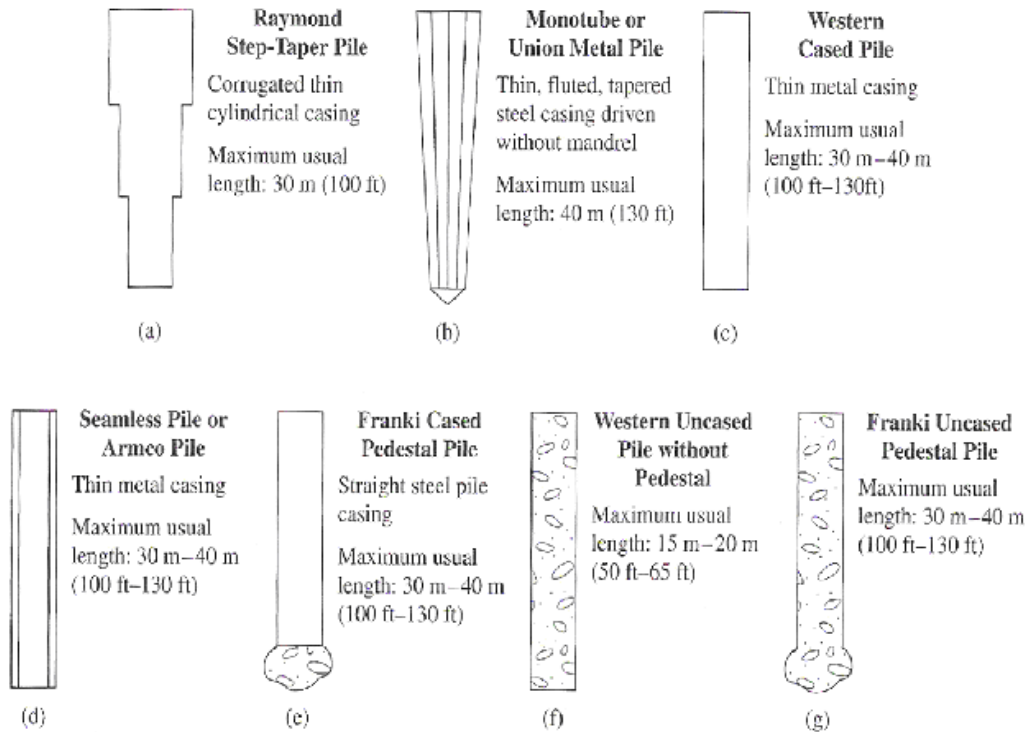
Cast-in-situ (cast-in-place) concrete piles (Das, 1999)
